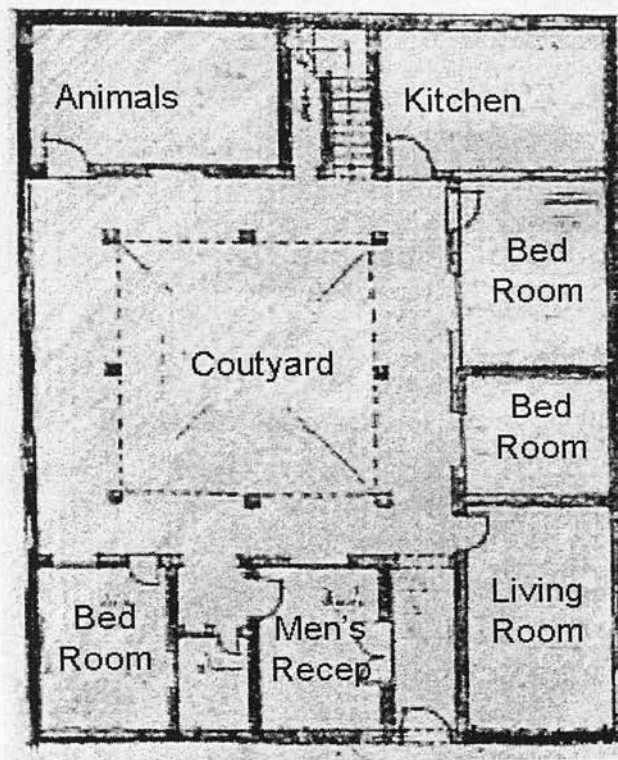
Floor plan of traditional Kuwaiti courtyard house A
